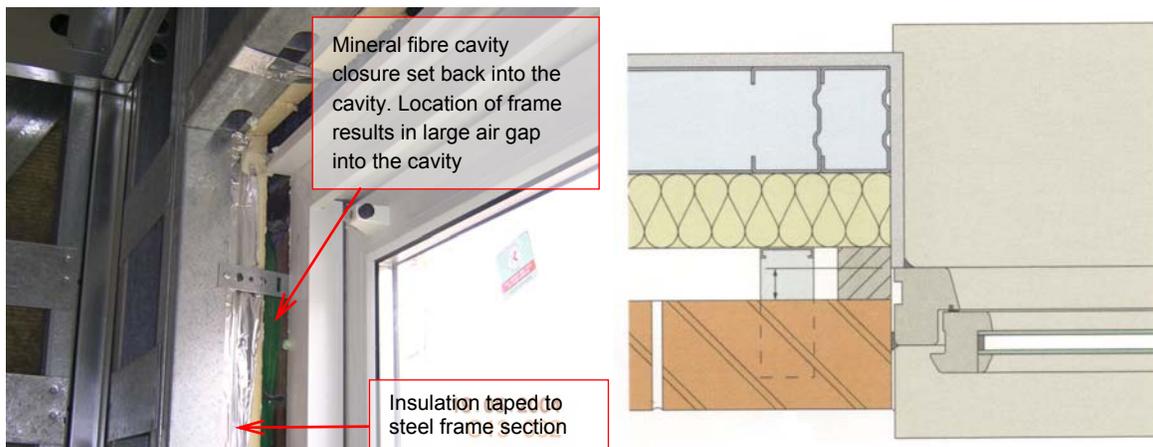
Door opening in steel frame construction (as constructed) compared with robust detail 7.06.
